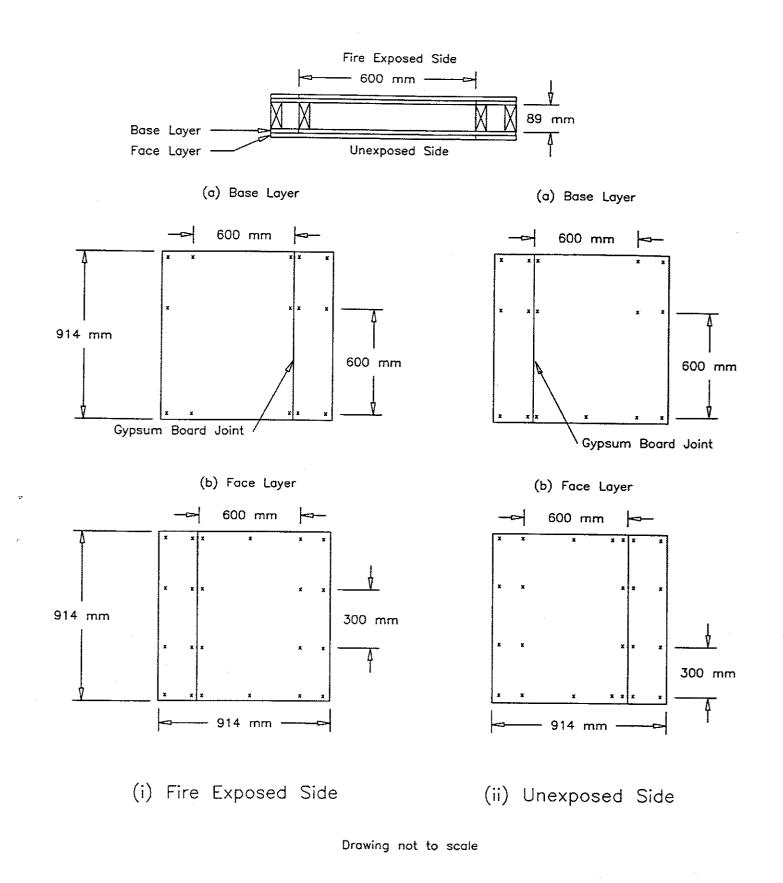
Screw Locations for 600 mm O.C. Wood Stud, 2x2 Regular Gypsum Board Layers, Small-Scale Assembly S-02
